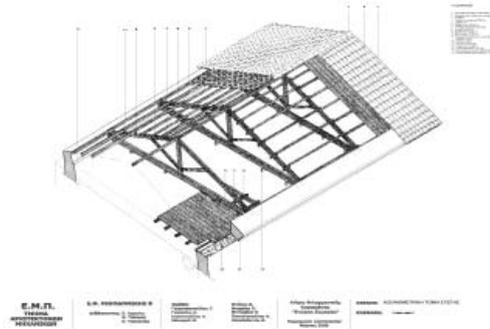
The "Philharmonic Orchestra" building. Isometric construction plan of the roof.
